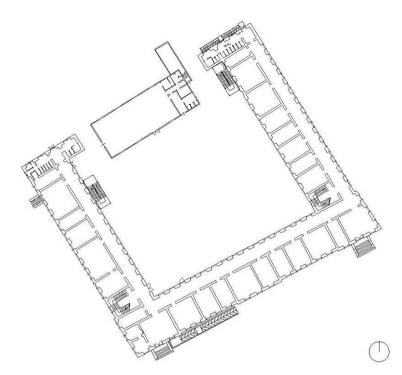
CL5 building plan: first floor. The second floor is not represented as it is exactly the same as the first floor. Scale 1:1000.
